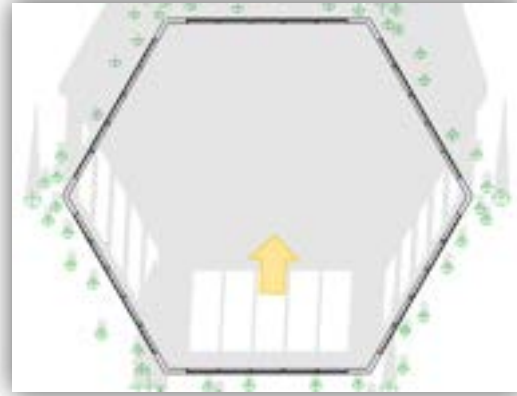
plan view at 3:00 PM (15:00) on an Equinox (March or September) with slab-to-slab windows and two-foot roof overhang. Source: primary.
